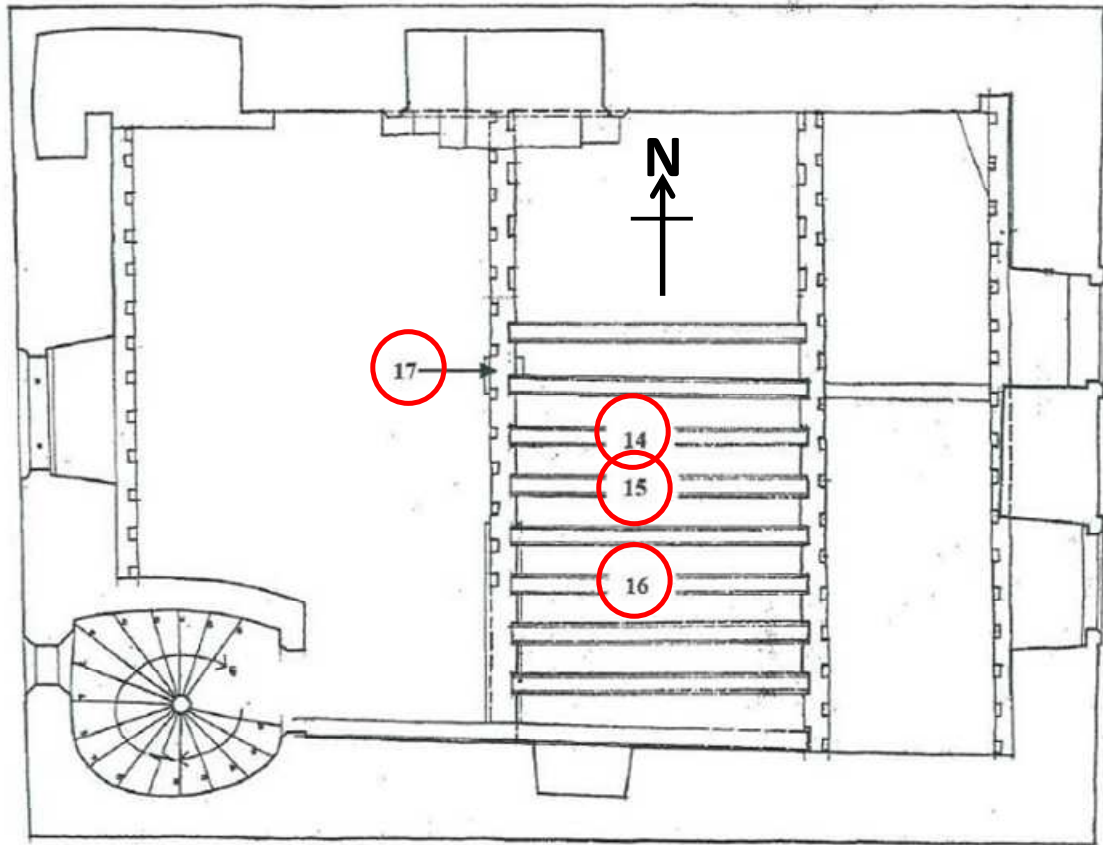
Plan at first-floor floor-frame level to help locate sampled timbers (after Department of the Environment)
